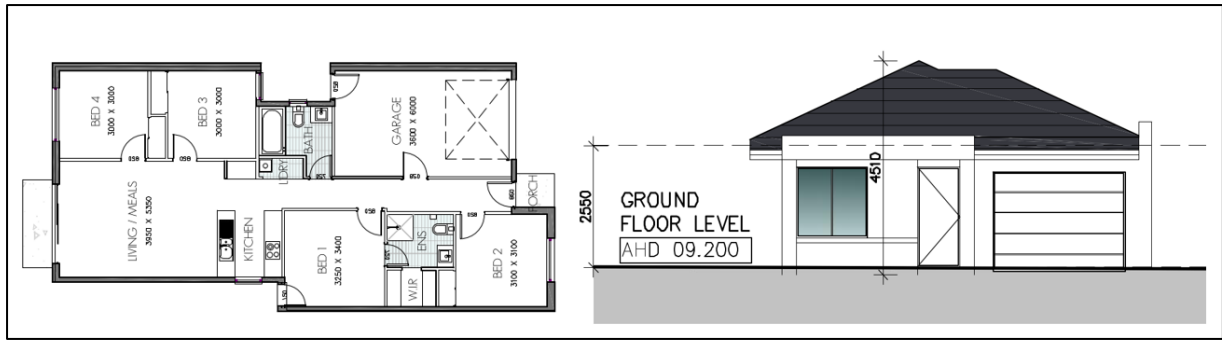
(above): Layout H Units floor plan (left) and front elevation (right). Source: Application documents.
